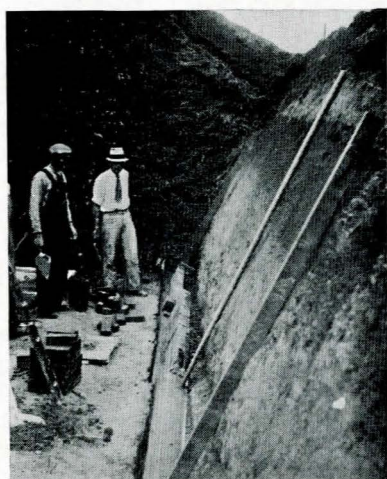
A piece of 2"x4" was used at either side of work to hold the guide strings while laying the experimental walls. Note the sloping concrete footing at base.
